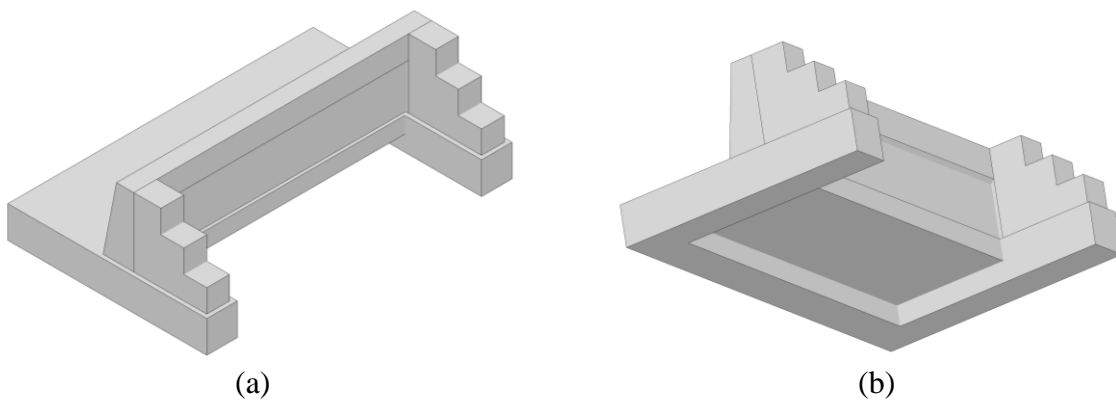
Preliminary FEA model of deck-railing impact test specimen: (a) Back isometric view; (b) Isometric view underneath—to show how the central deck portion of the specimen is elevated, similar to a typical bridge deck overhang
